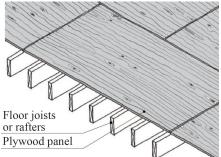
Installation of plywood panels: they must be oriented with their long direction perpendicular to the supporting members and a gap of 3.2 mm must be left all around panels to accommodate moisture expansion (from [36])
